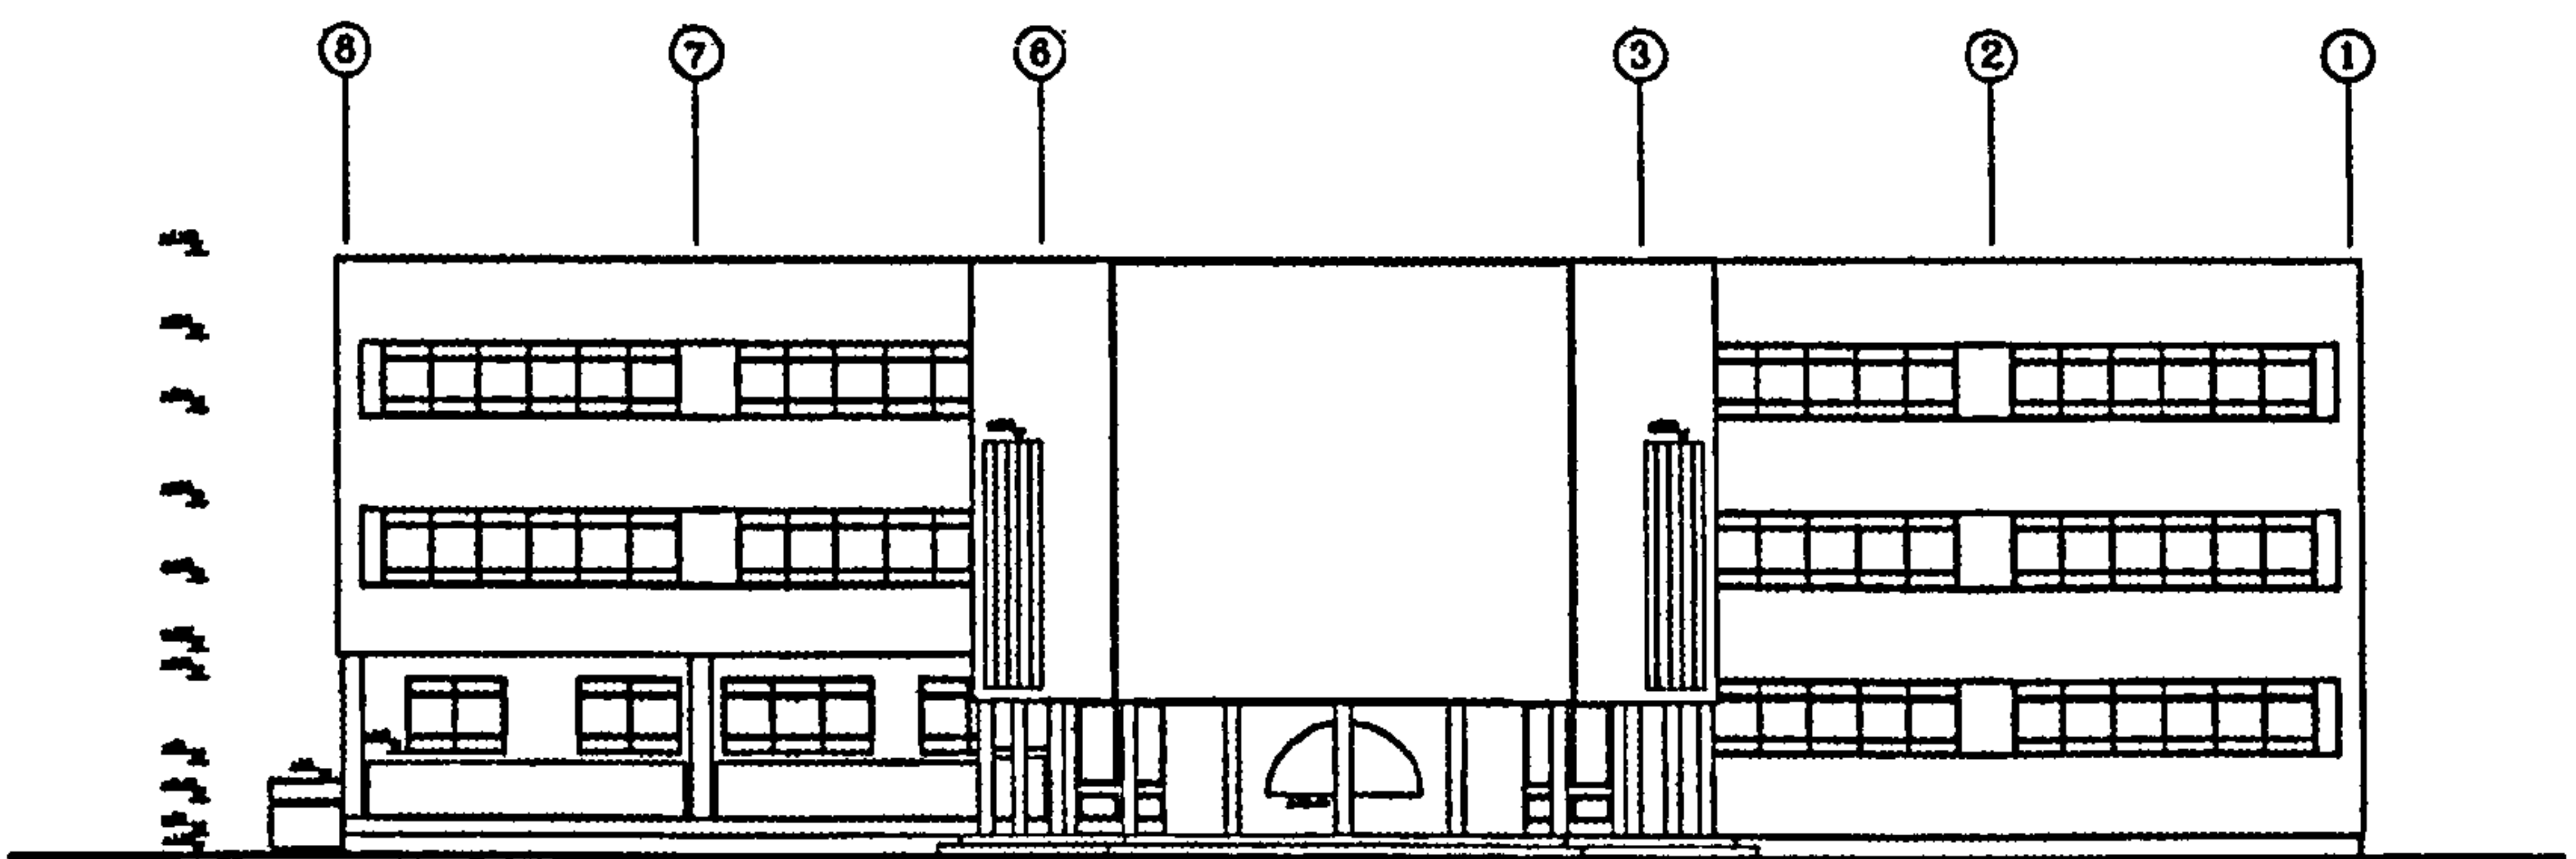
The south elevation of a primary school with 20 classrooms (Number 1)
